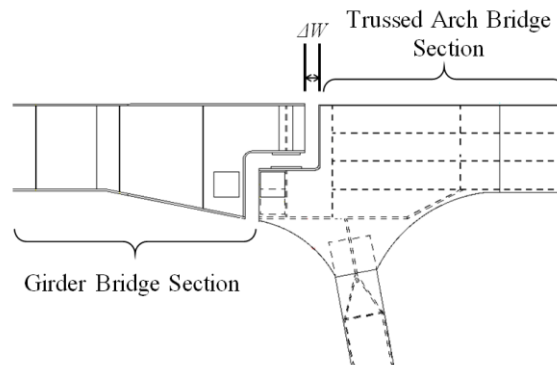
Detail of joints between trussed arch (modified from Ref. [3])
